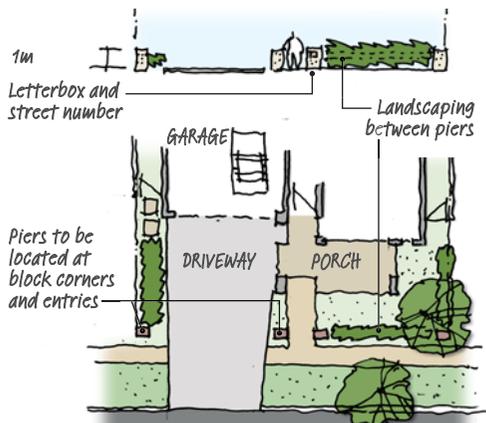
Fence Type 1 - Piers and infill landscaping
